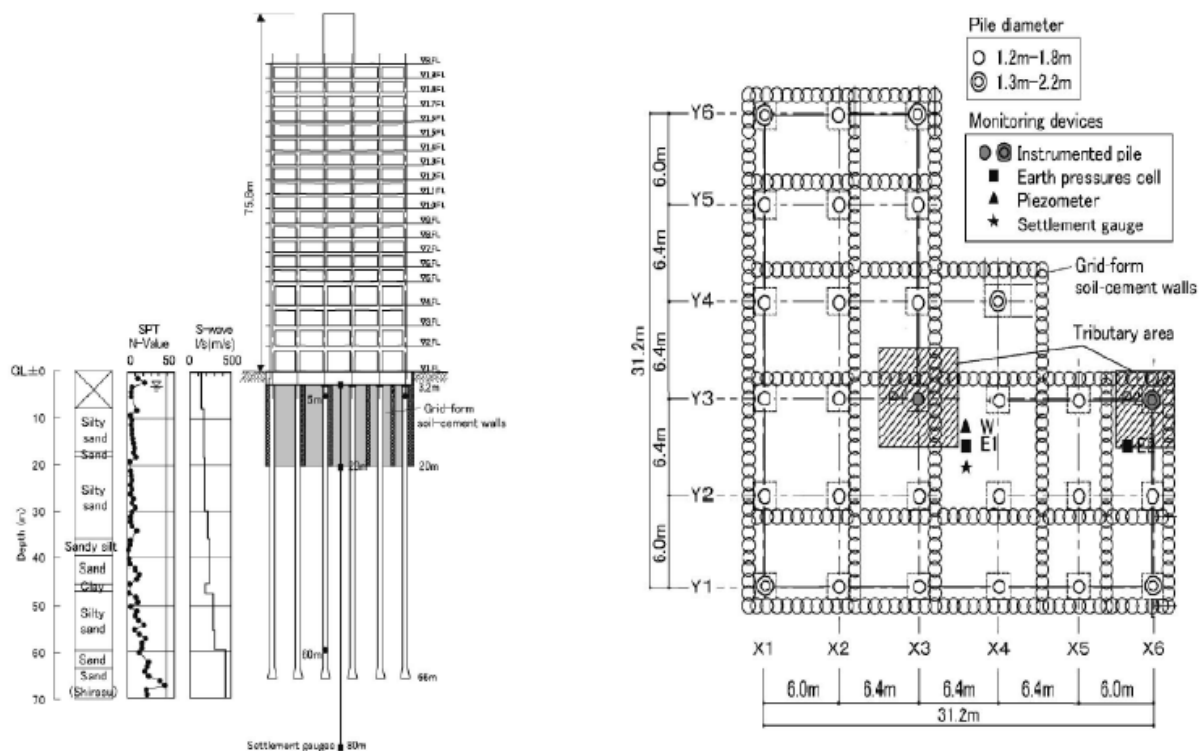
Soil profile, foundation plan and elevation of nineteen-story residential tower (Yamashita et al. 2011)
